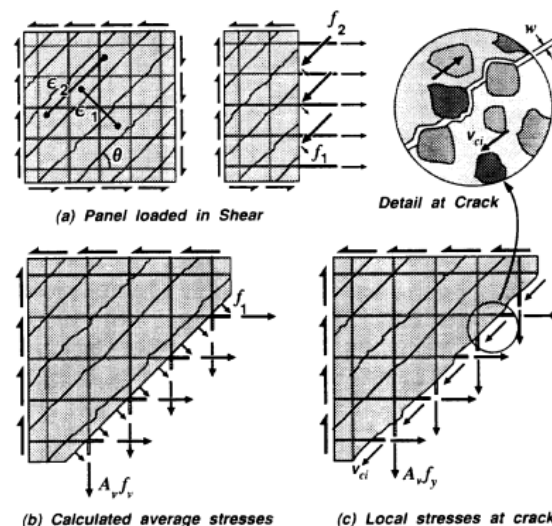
Reinforced concrete panel subjected to shear [7]
